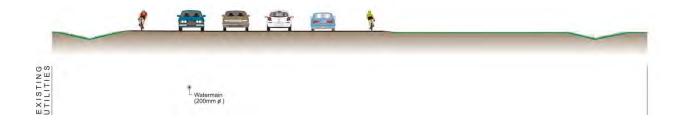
TYPICAL CROSS-SECTION COUNTY ROAD 42 PUCE RIVER BRIDGE TO COUNTY ROAD 25 (E. PUCE ROAD)
